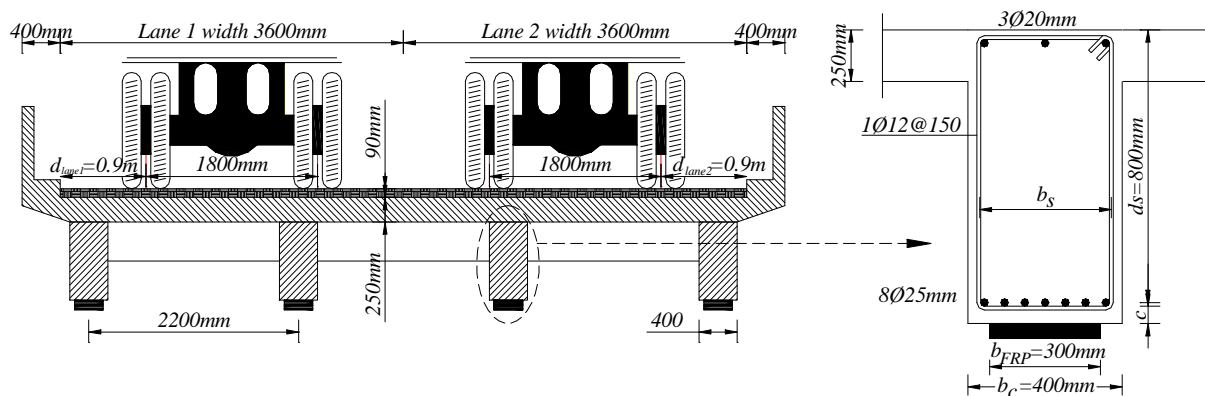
Bridge cross-section and trucks position; Reinforcements and dimensions details of the interior beam
